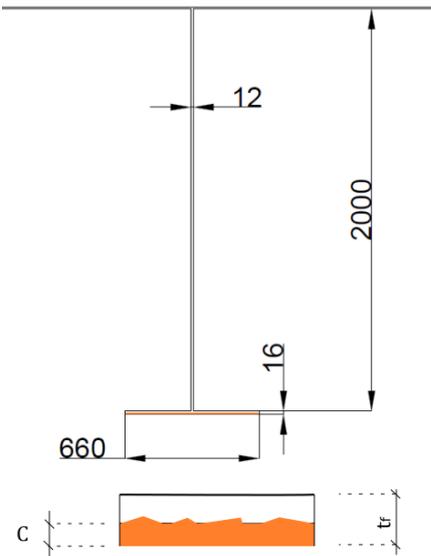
Uniform corrosion penetration of bottom flange primary crossbeam.
